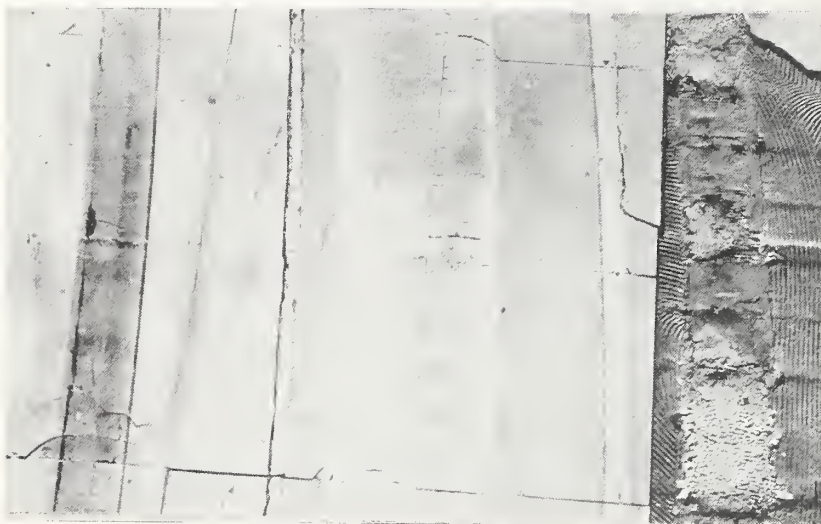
$\frac{1}{8}$ -in. asphalt tile, cumar-resin type, on wood subfloor (test panel 18L).
